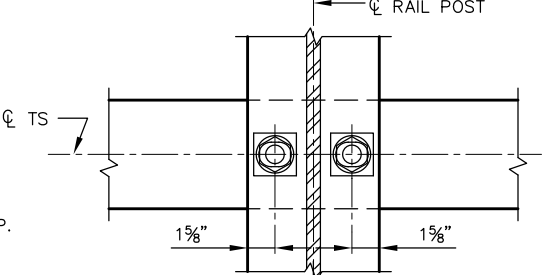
DETAIL AT END POST (THRIE BEAM RAIL ATTACHMENT)
